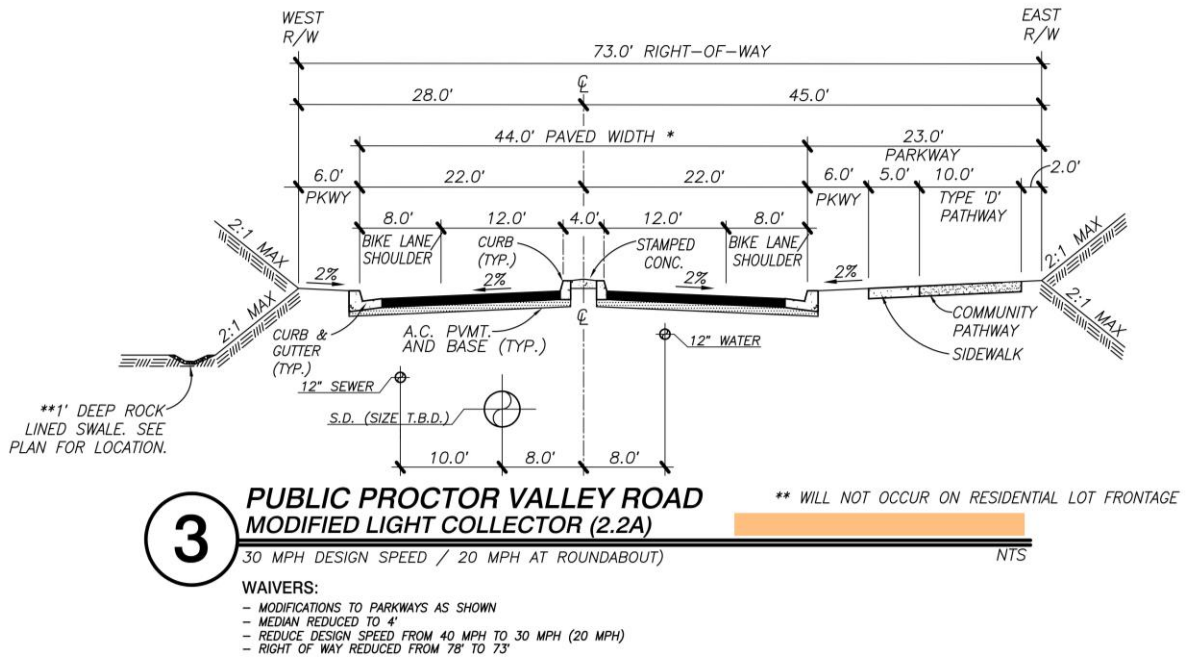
Street Section 1 – Proctor Valley Road –
